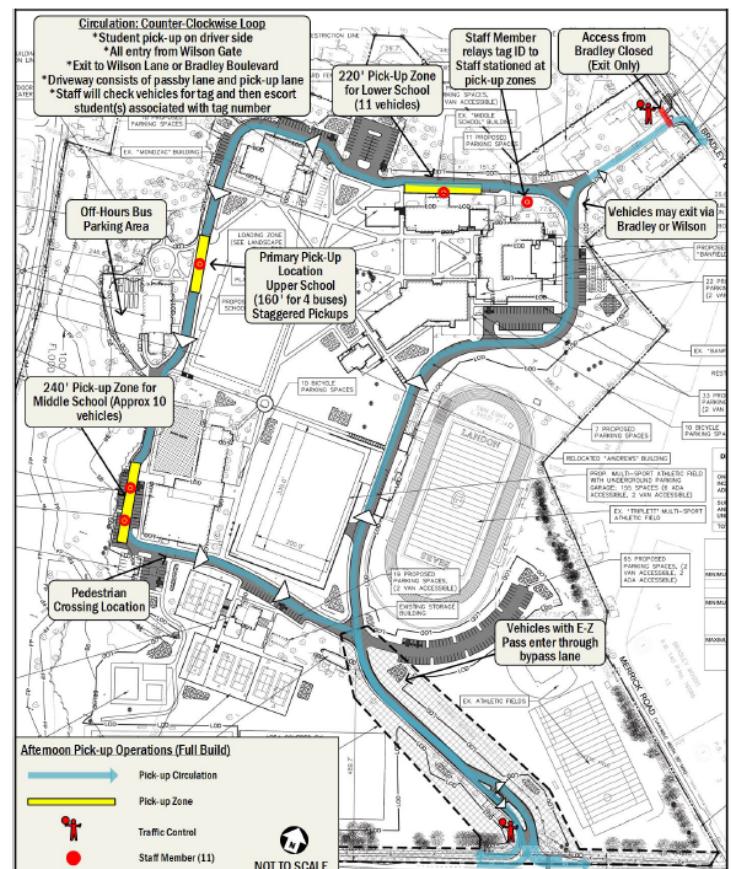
Afternoon Pick-up, Proposed Full Build-out
